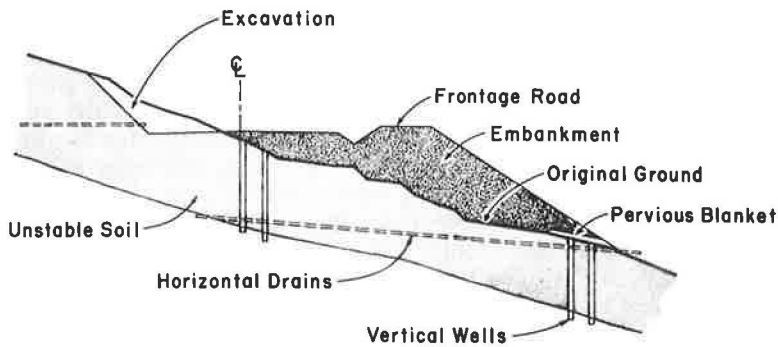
Typical section of horizontal drains, vertical relief wells, and pervious blanket.
